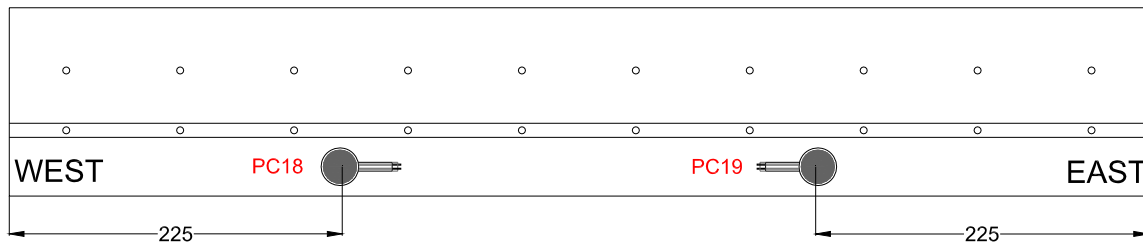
Strain gages and pressure cells of cantilever wall in level ground model GC01.
